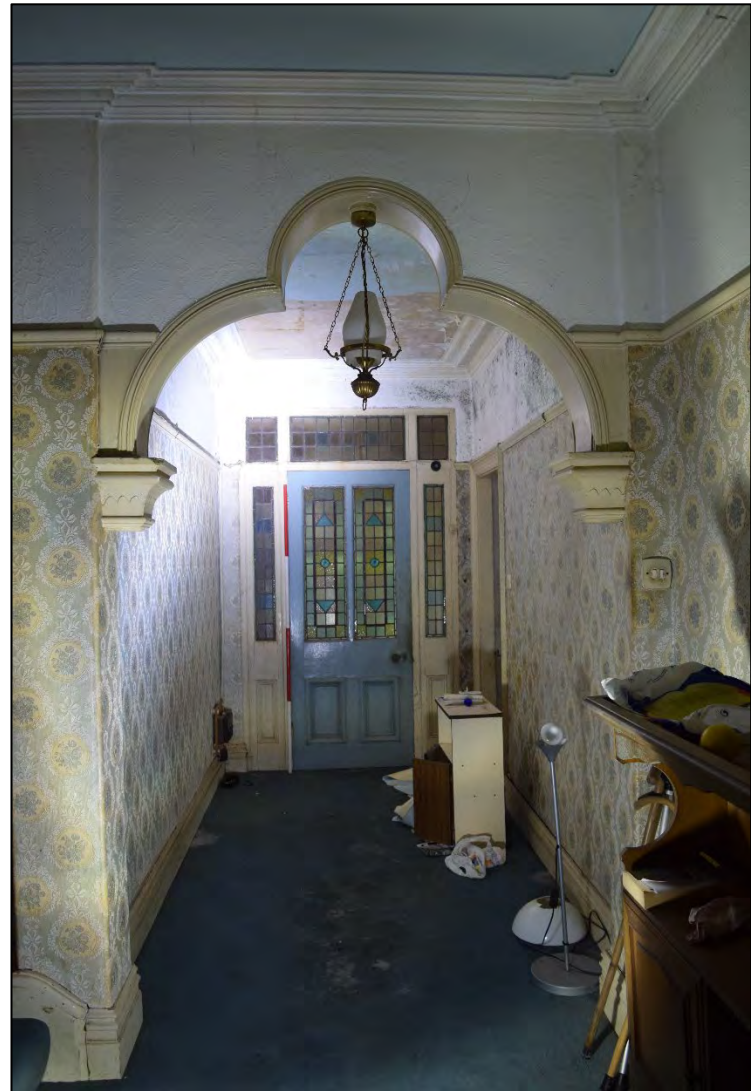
Trefoil-headed arch in Hallway, Room 4, looking west. Scale 2m.
